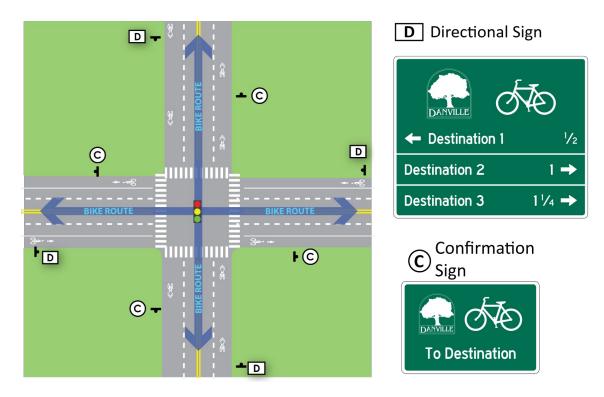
On-street Intersection Sign Placement - Two Routes, Multiple Destinations
